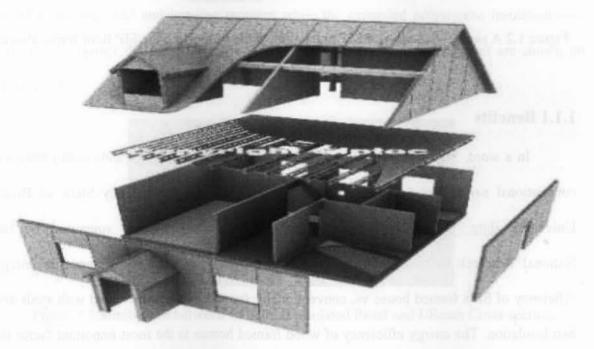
Aapplication of the Structural Insulated Panel in a single family dwelling.
